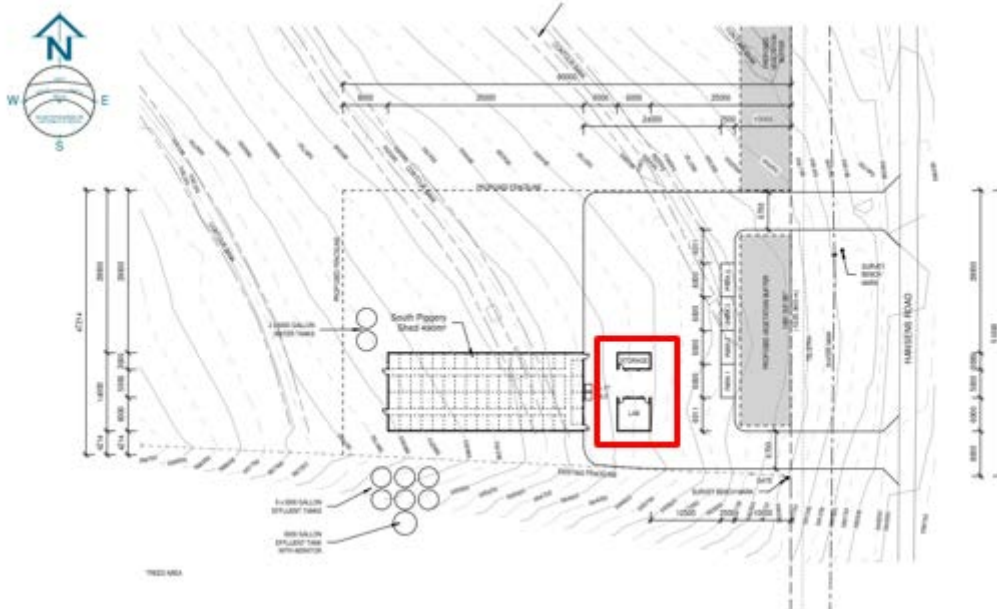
Site plan for proposed use for Stage 1 (temporary structures outlined in red)
